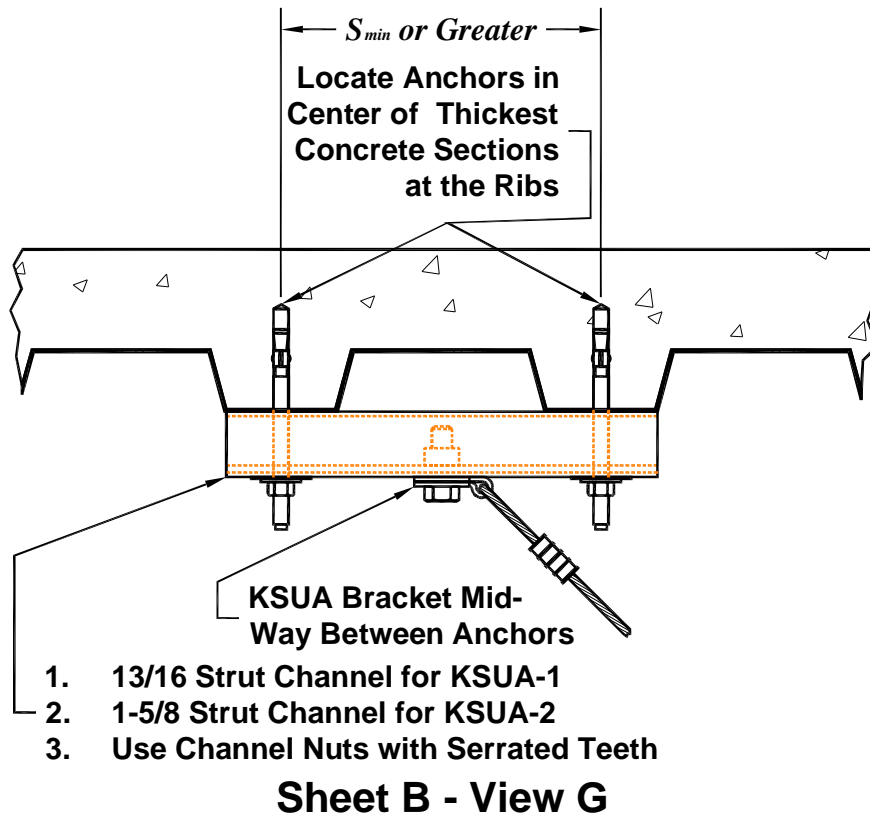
; KSUA Bracket Attached to Strut Channel Anchored to Concrete Poured on Corrugated Metal Decking
